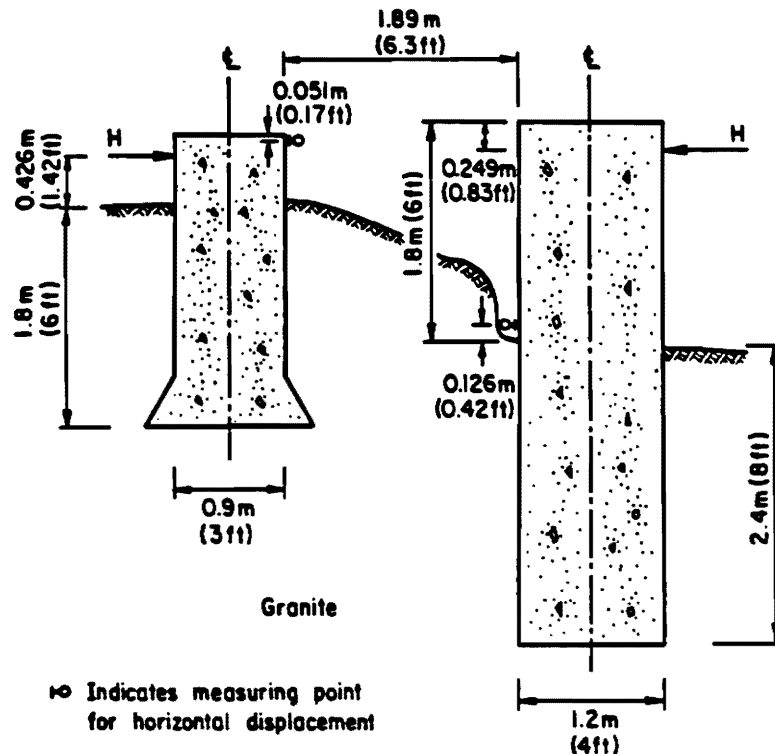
Details for Rock-Socketed Shafts G and H.
